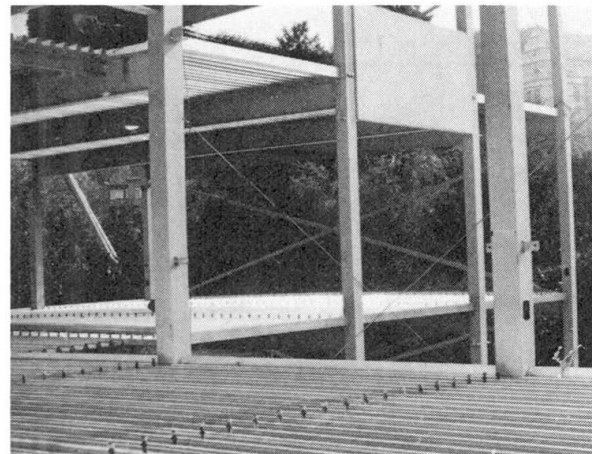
Hollow section composite columns (openings for concrete filling): Office building, Bielefeld, W-Germany, 1980
